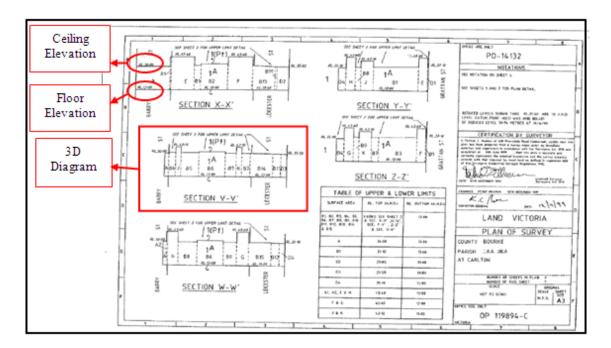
Cross-sections on plan of survey – Sheet 3
